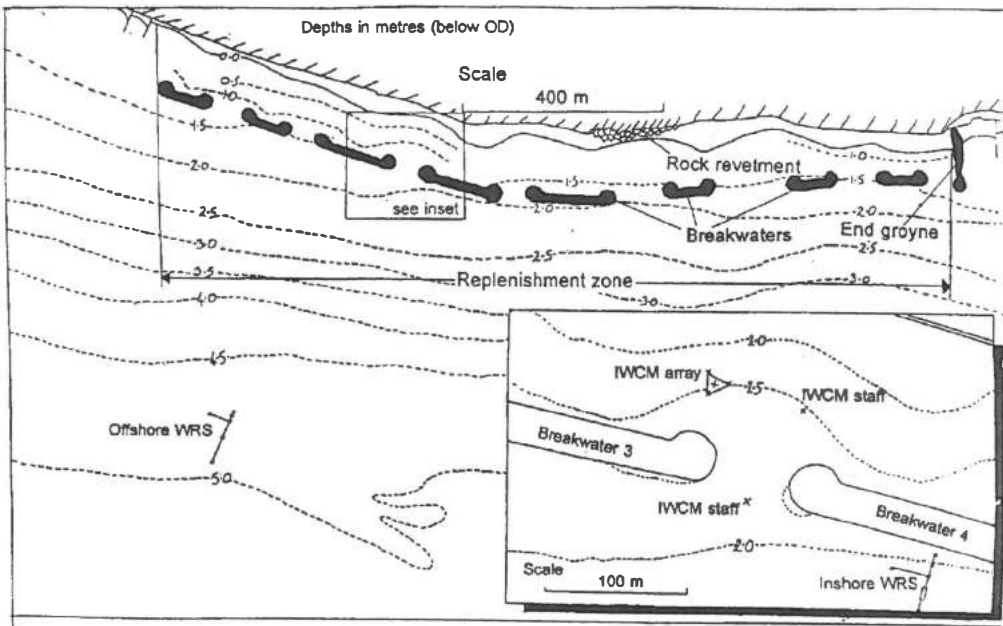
Plan of breakwater scheme, showing layout of instrumentation
